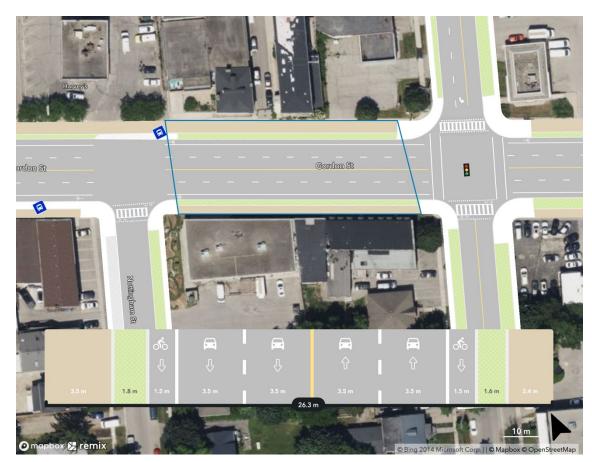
Design Option 2.2 Example between Wellington Street and Waterloo Avenue
